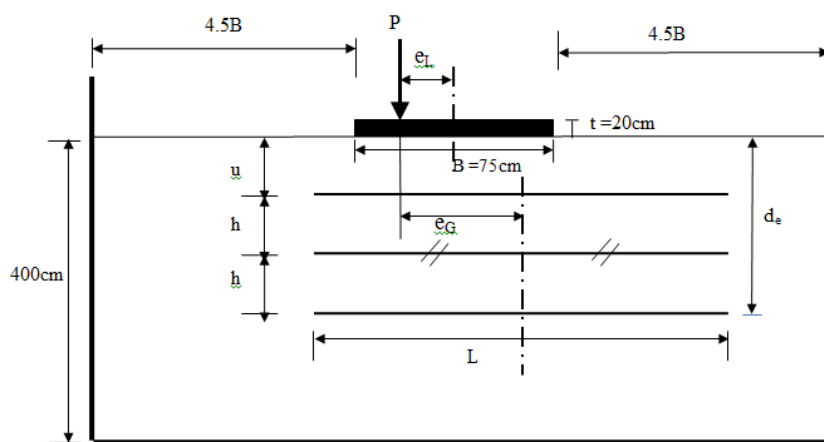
Model of eccentrically loaded strip footing resting on geogrid-reinforced sand.
